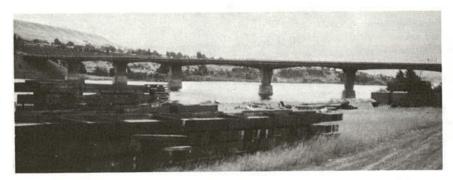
Columbia River Bridge at Olds, Washington, a seven-span concrete box girder bridge with both abutments on spread footings (1).
